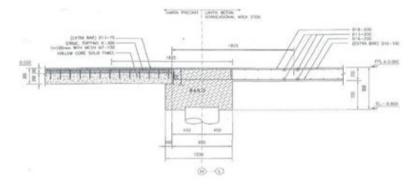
Cross Section Floor Plate Prefabrication Concrete
